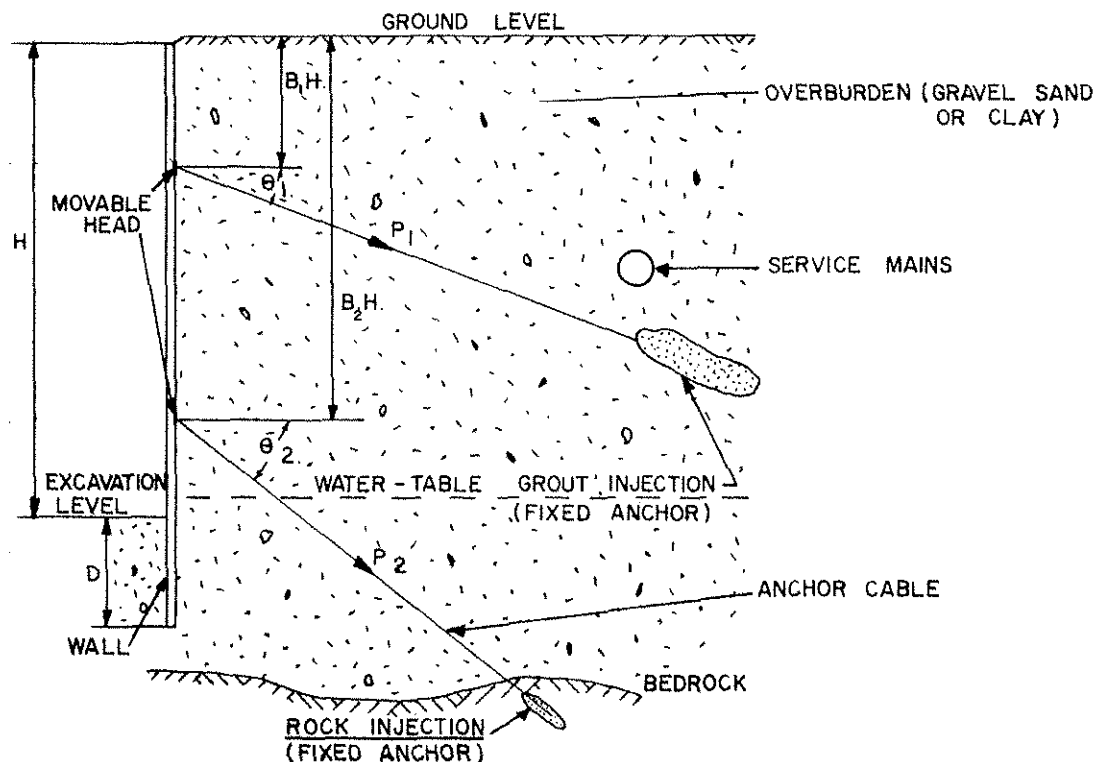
Principle of tie-back wall. This method of wall support eliminates struts which in turn brings large economic and construction advantages.
